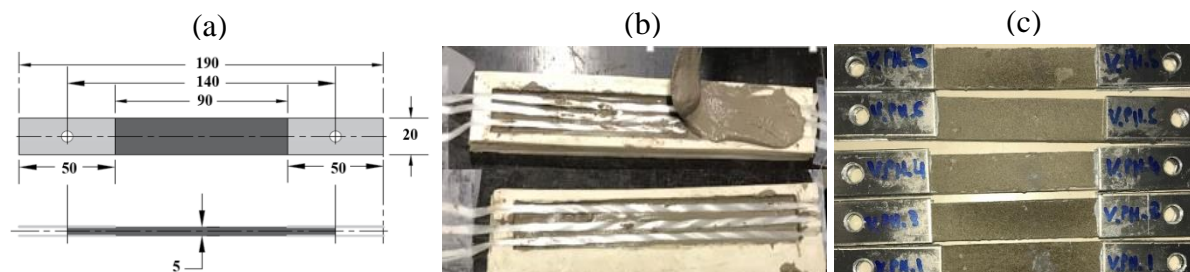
(a) specimen geometry (measurements in mm); (b) specimen preparation; (c) specimens ready to be tested
